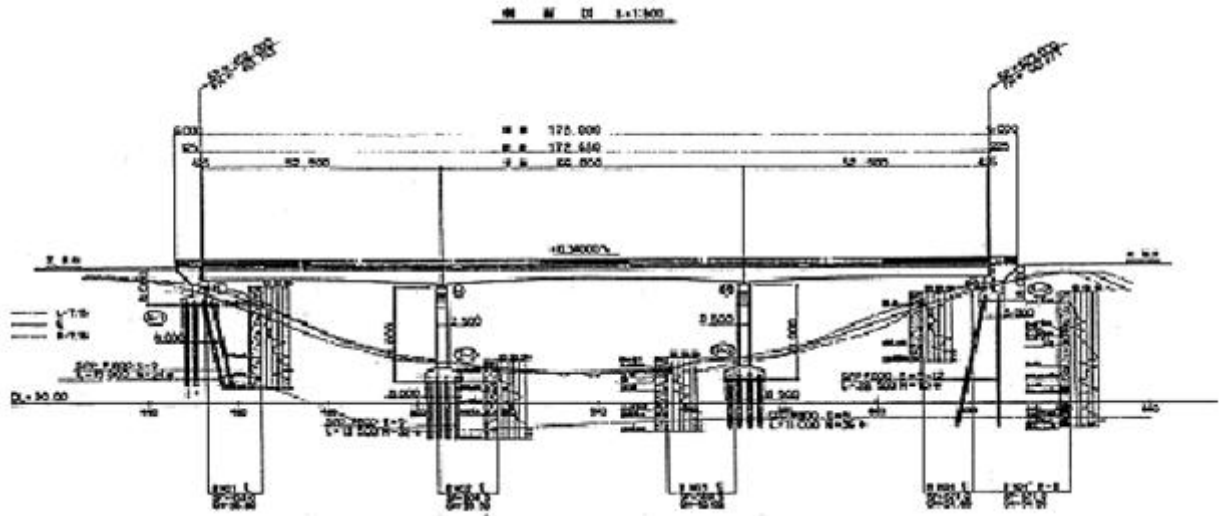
Lateral view of Bridge A (Skewed angle: 90°)
